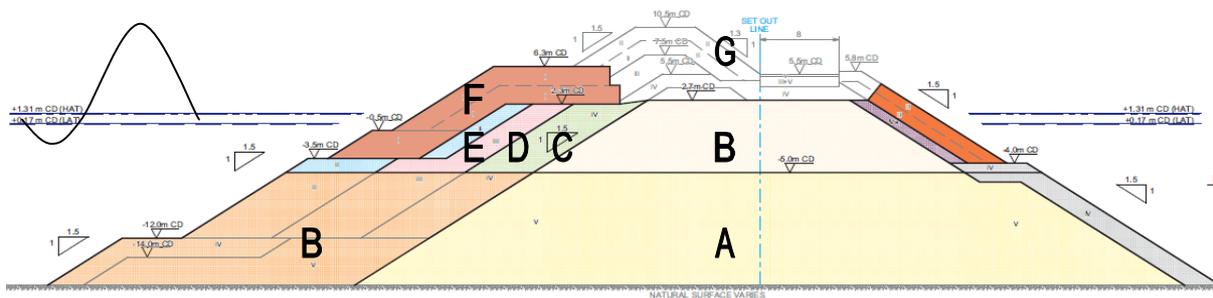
Typical Breakwater Cross Section, Construction Phases A to G shown
